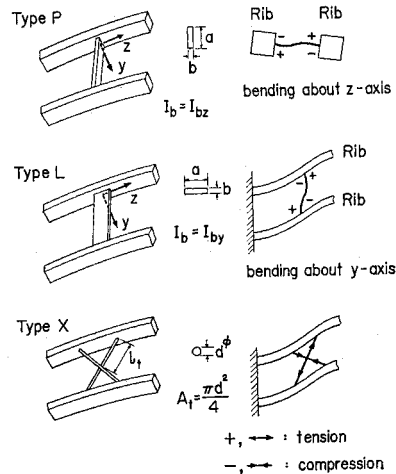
Arrangement and Induced Deformations of Bracing Members.
